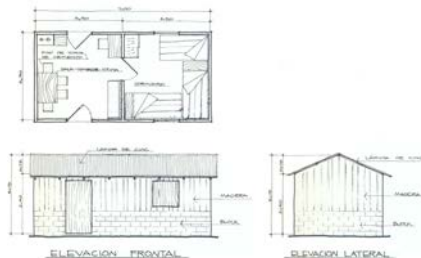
Plan and elevations of a typical minifalda building (location: San Raymundo, Guatemala; from Marroquin and G
